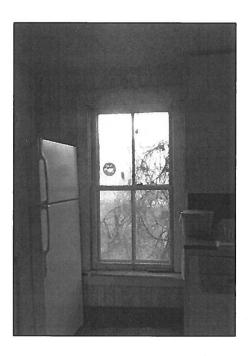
Above: 2x2 panes type window sash in north wall of main kitchen on ground floor, 2016:
